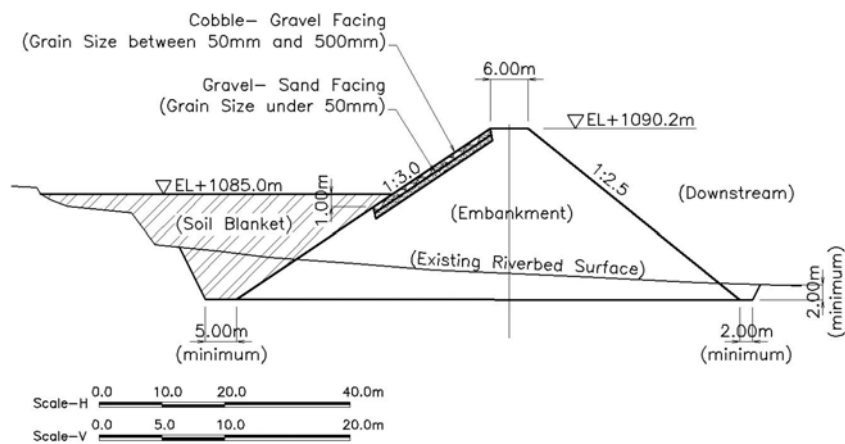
Typical Cross Section of Proposed Sediment Control Dam Works
